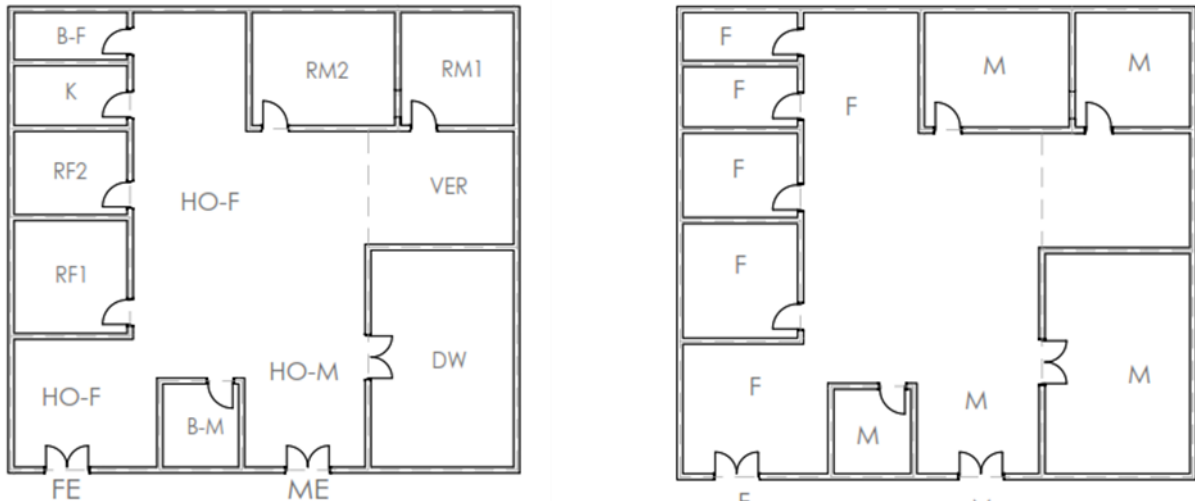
Case 5 - Layout Plan and the Male & Female Domains Layout
